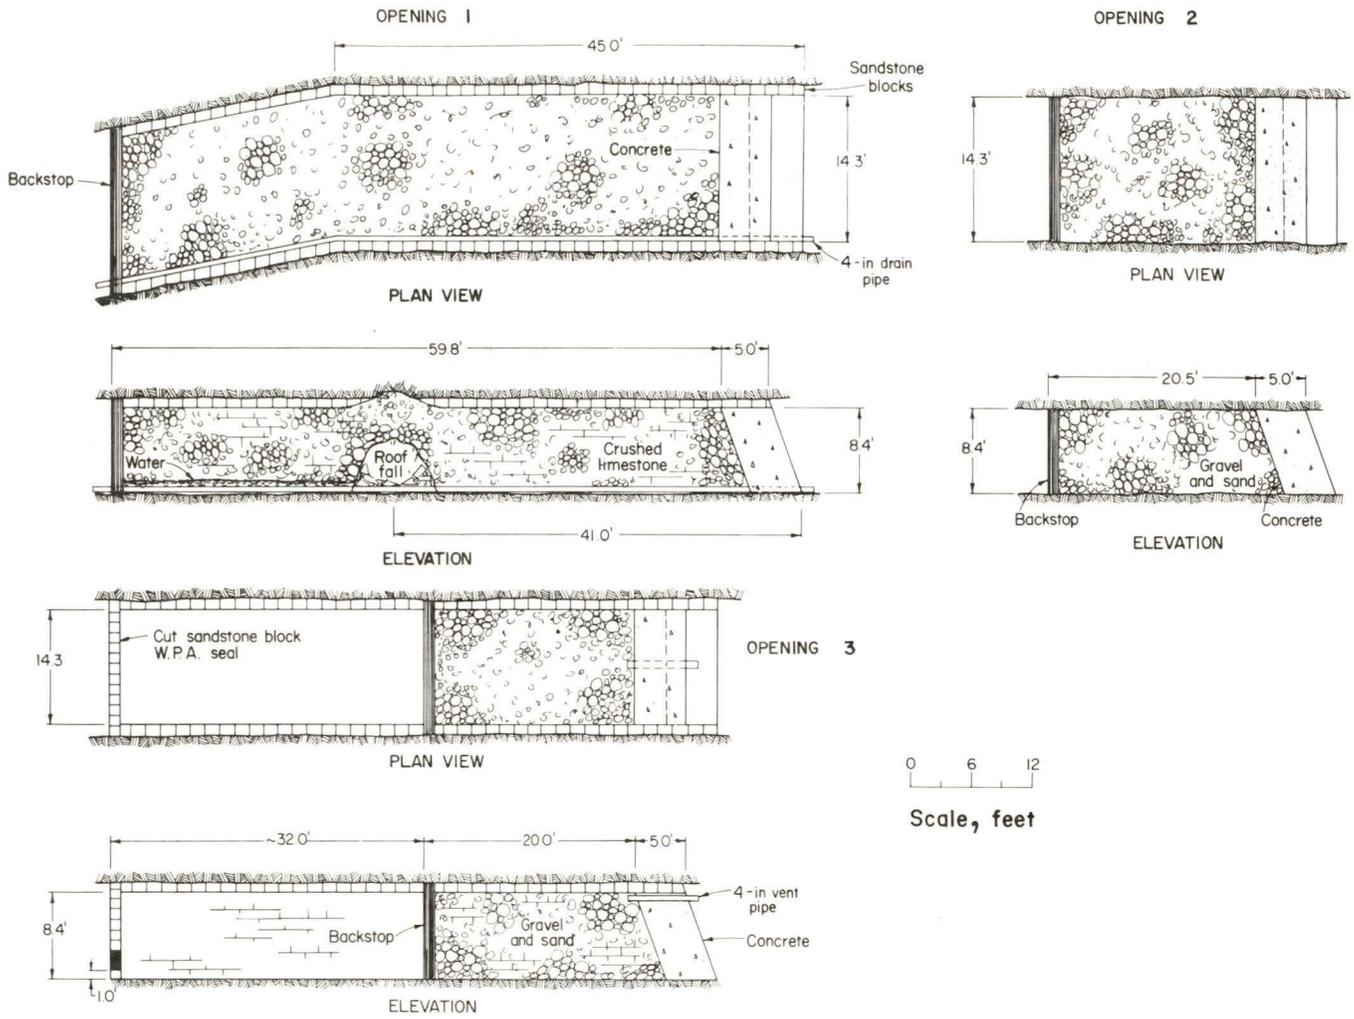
Plan views and elevations of sealed openings at Peacock Mine, openings 1, 2, and 3.
